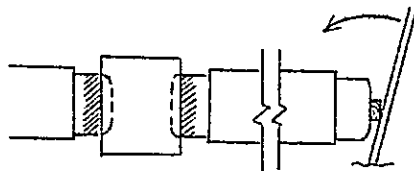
Assembling 3", 4" or 6" Pipe Joint with One Push
